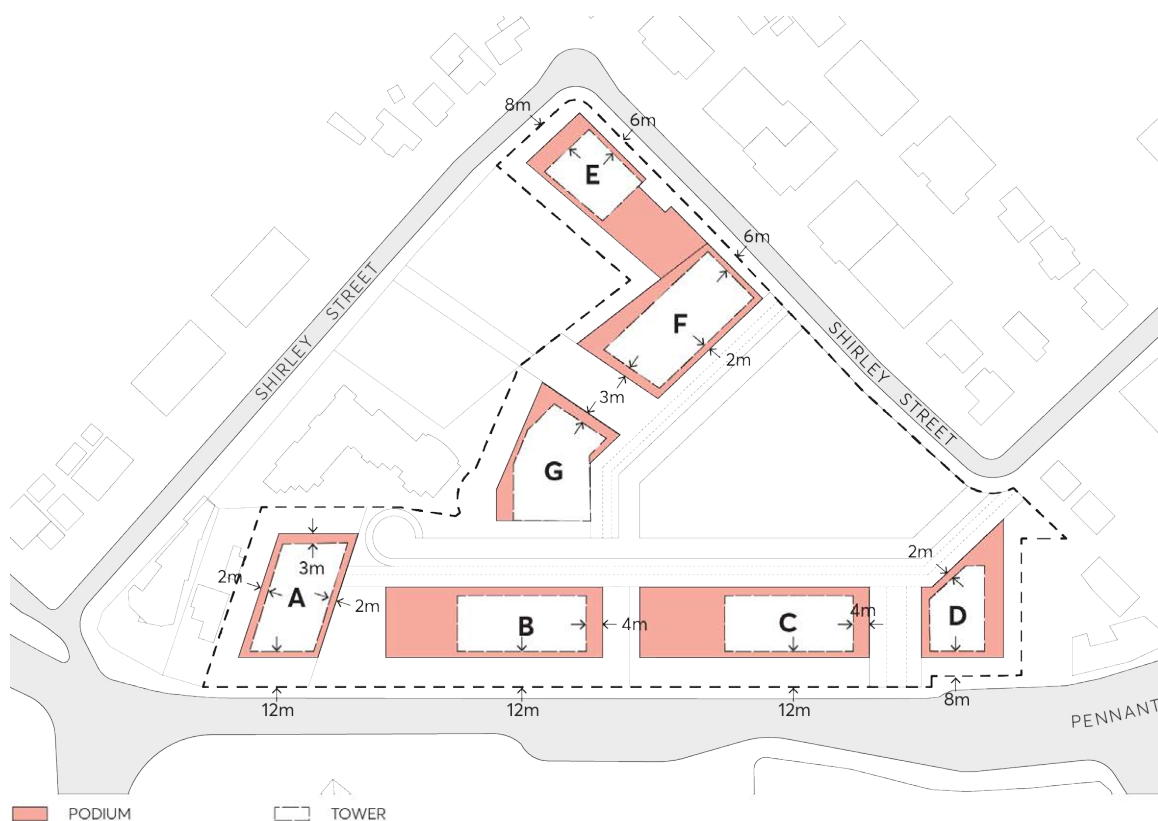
Minimum Required Upper-Level Building Setbacks and Tower Location
